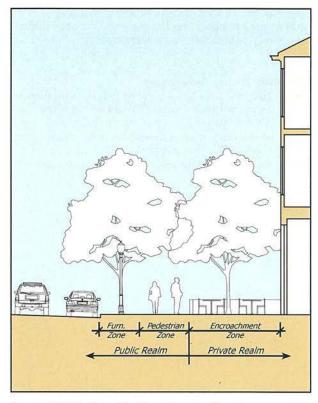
Cross Section, Terrace Frontage (Illustrative)
